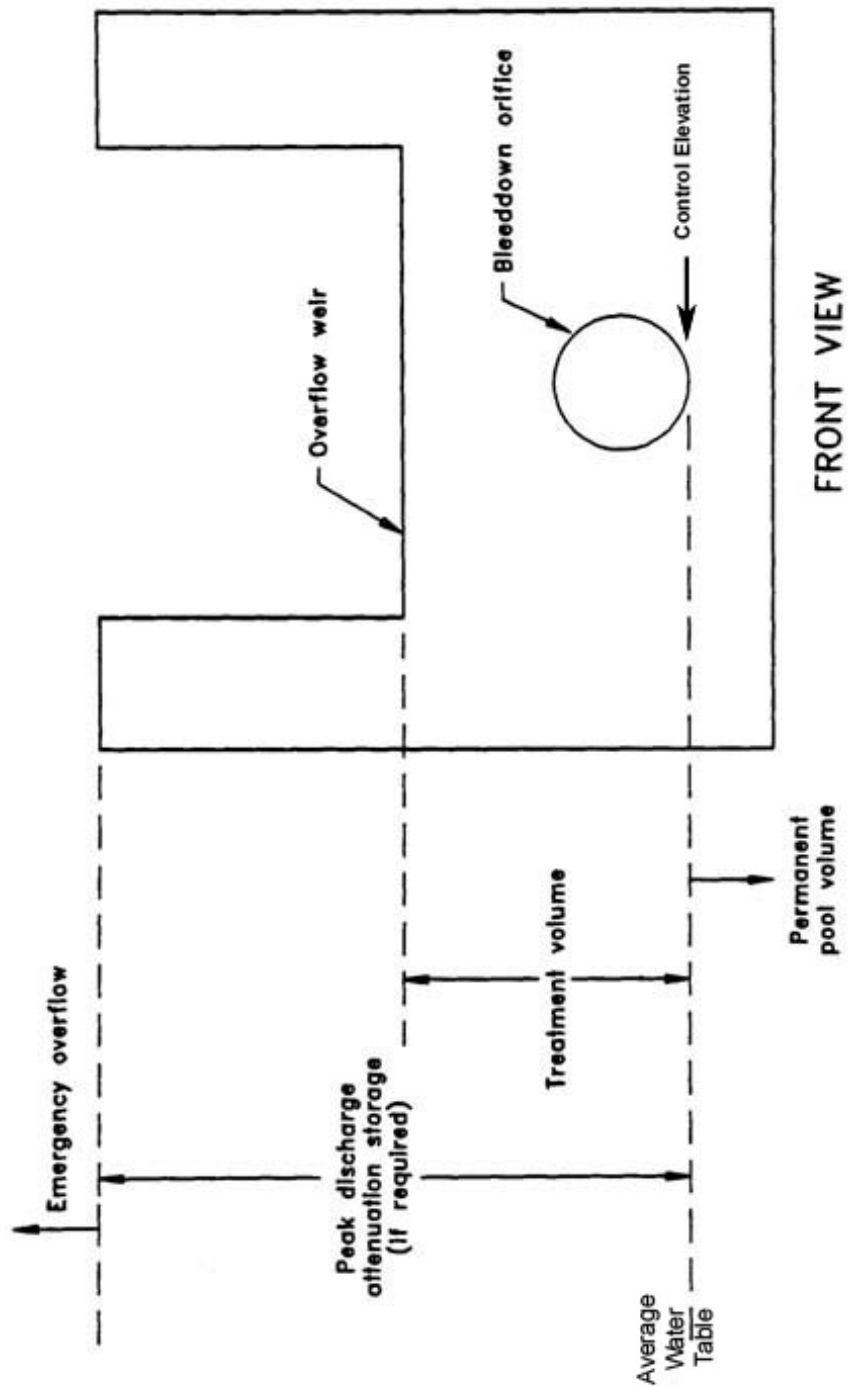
Typical wet detention outfall structure (N.T.S.).
